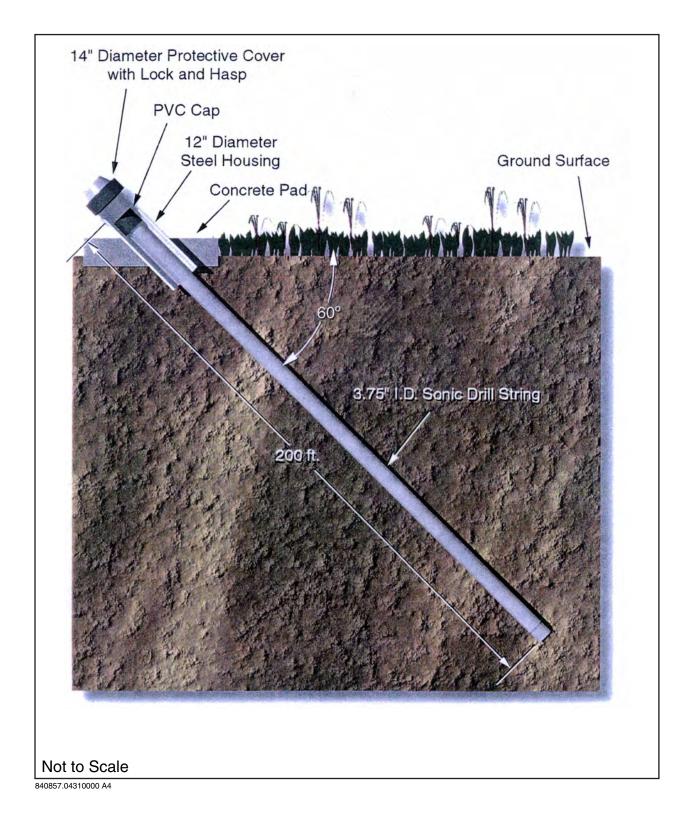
Soil-Moisture Monitoring Access Tube, Mixed Waste Landfill
